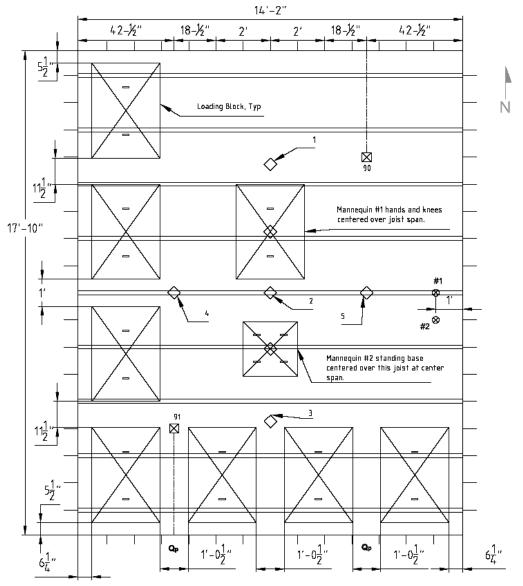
Loading and Instrumentation Layout (See Figure A.2.8).
